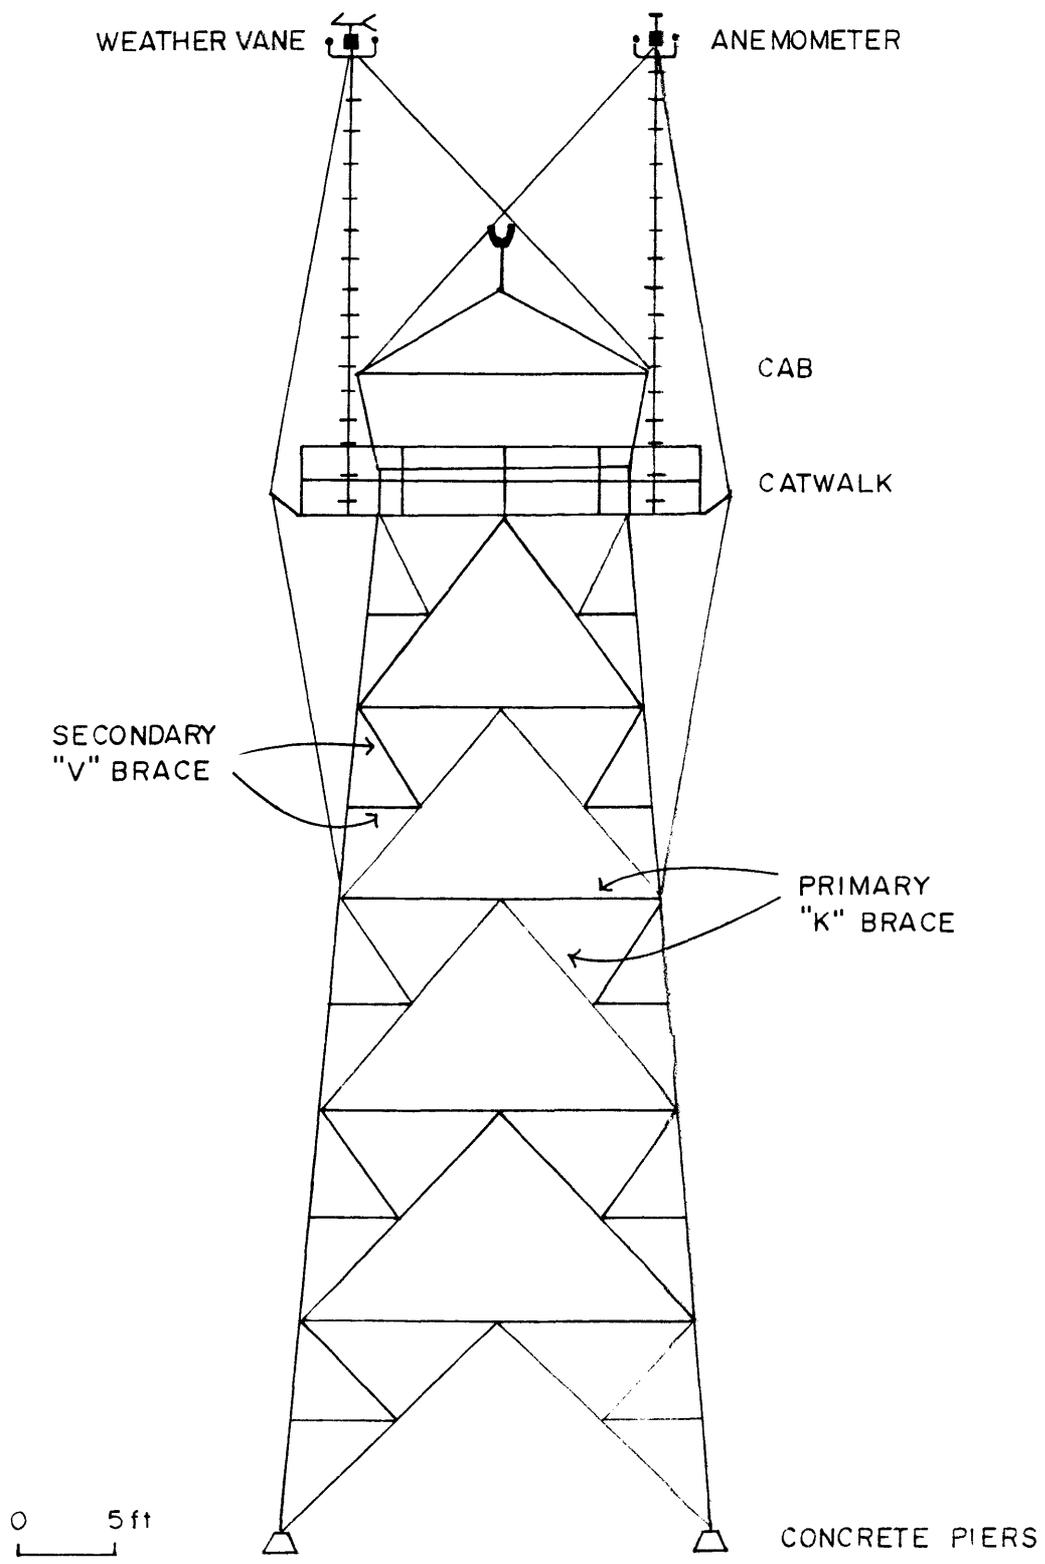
KAAF RADIO TOWER SKETCH SHOWING BRACING PATTERN AND GENERAL PROFILE (STAIRWAY NOT SHOWN).
